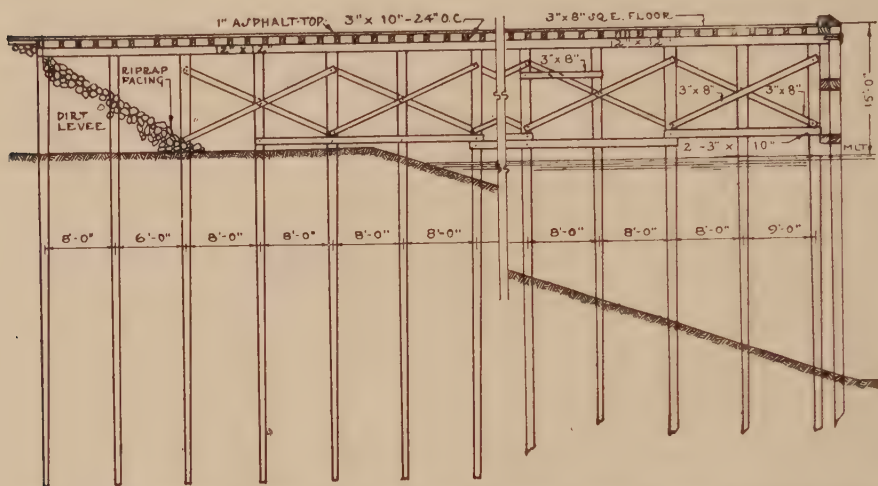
Cross-section of bent in wharf and timber shed construction at Corpus Christi.
